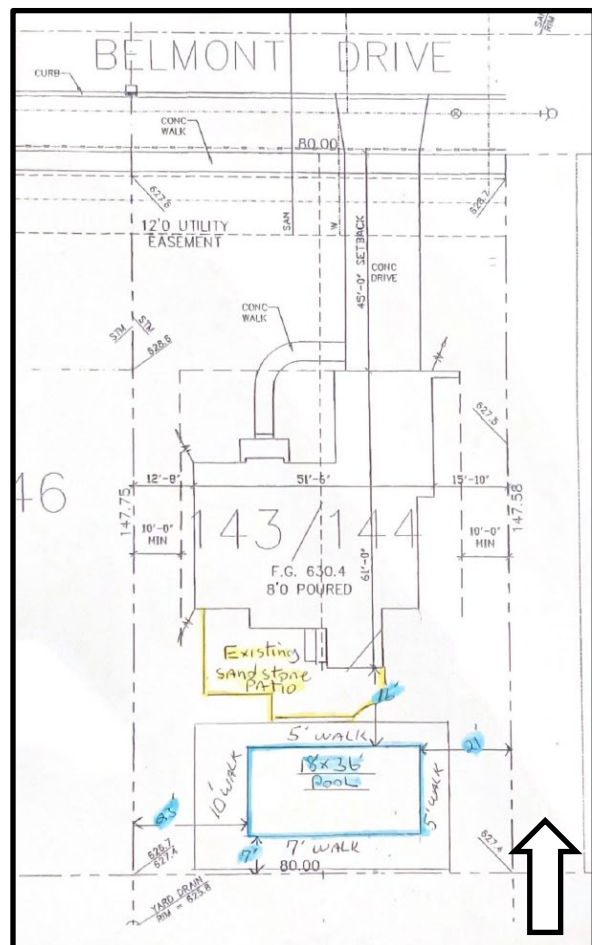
Site Plan – Applicant Provided (CAV 24-23)
